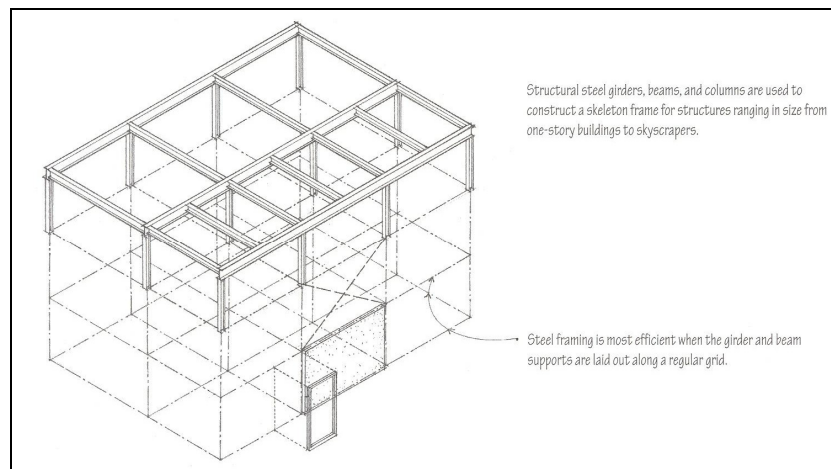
"*Structural steel framing* (Ching, 2001) [11]"
